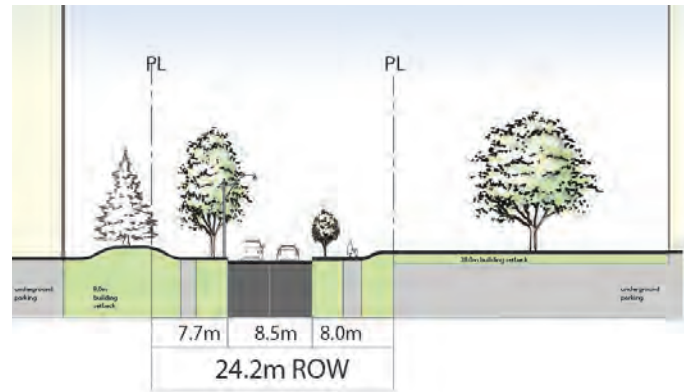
Oakmount Road, illustrative street cross-section diagram.
